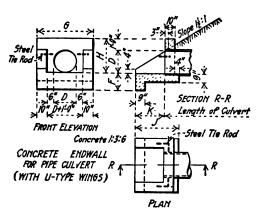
Concrete Endwalls for Pipe Cul-VERTS, WITH U-TYPE WINGS. U. S. BURBAU OF PUBLIC ROADS.
